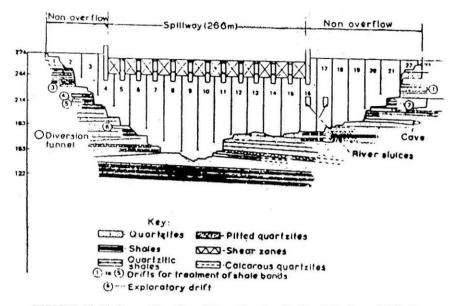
Upstream Elevation of Dam Showing Sectional Geology of Srisailam H.E. Project.
